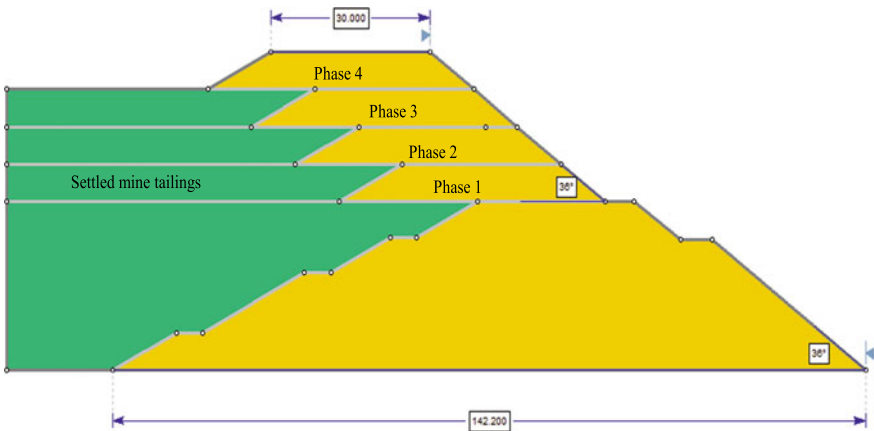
A typical cross-section of tailings dam at the end of construction using U/S method of construction
